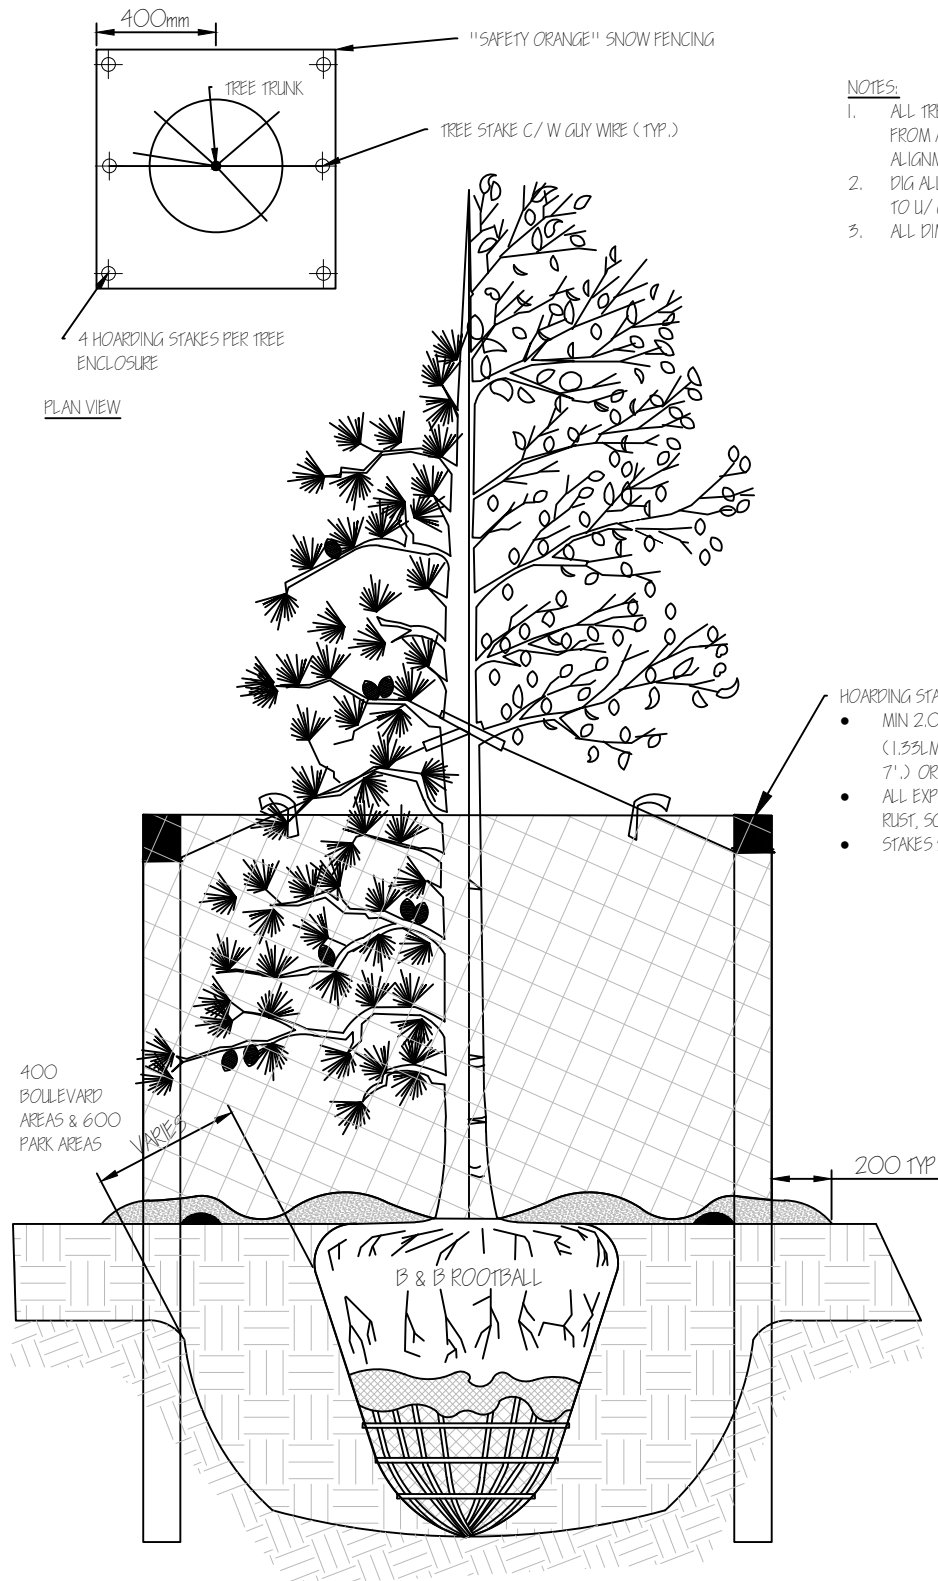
DETAIL B - TRESS WITHIN 3-5M OF ACTIVE CONSTRUCTION
